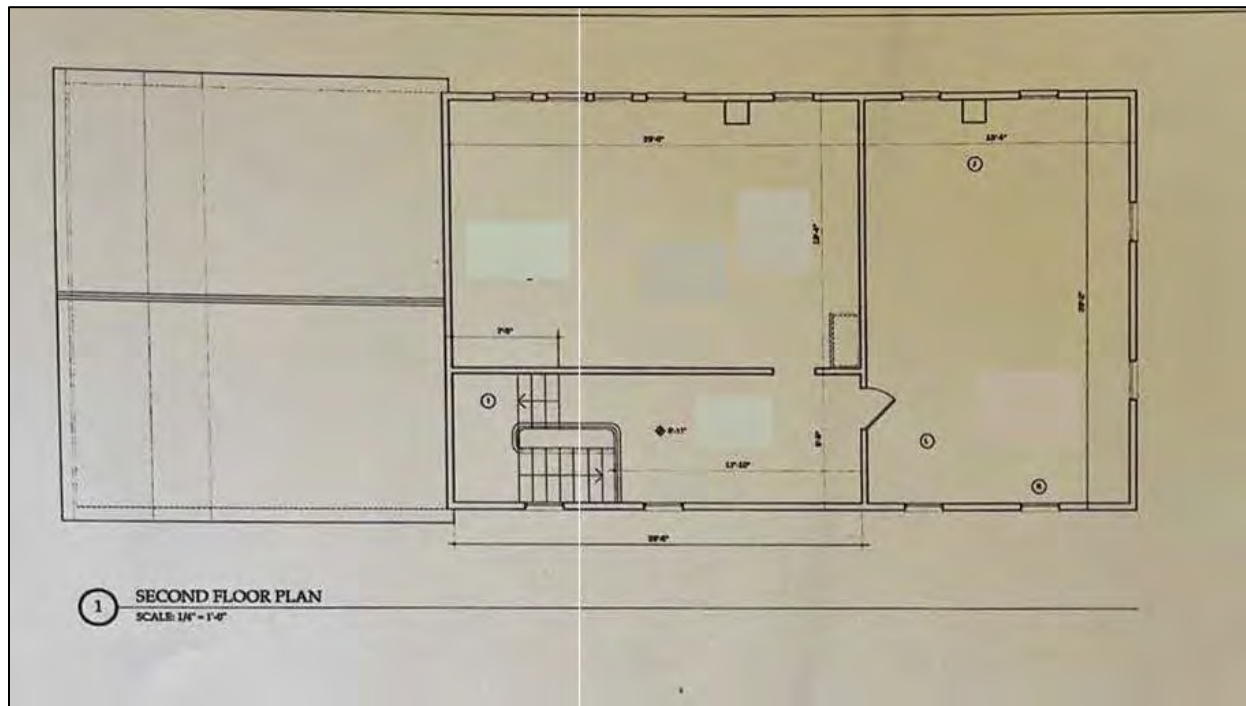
Second floor plan of Union Street School, showing existing conditions (Plan by Karl Riedel Architecture, PC, 2018).
